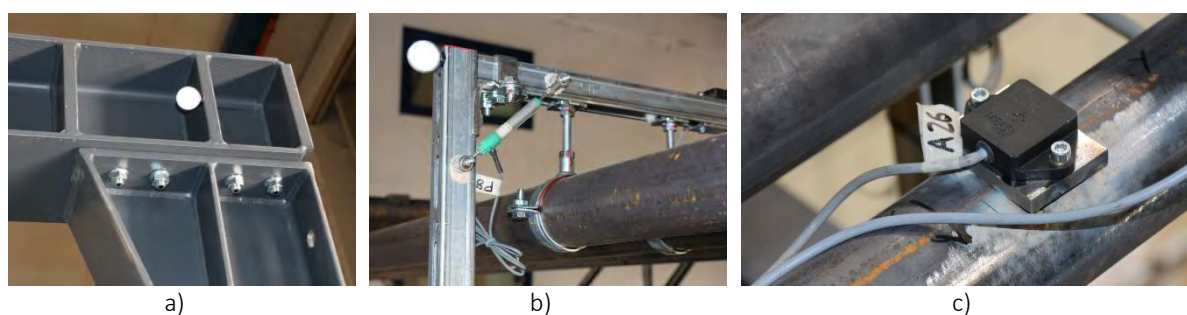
Instrumentation of tanks and pipes on the 3rd floor and roof top: a) Marker, b) Displacement transducer, c) Accelerometer on pipe DN 80
